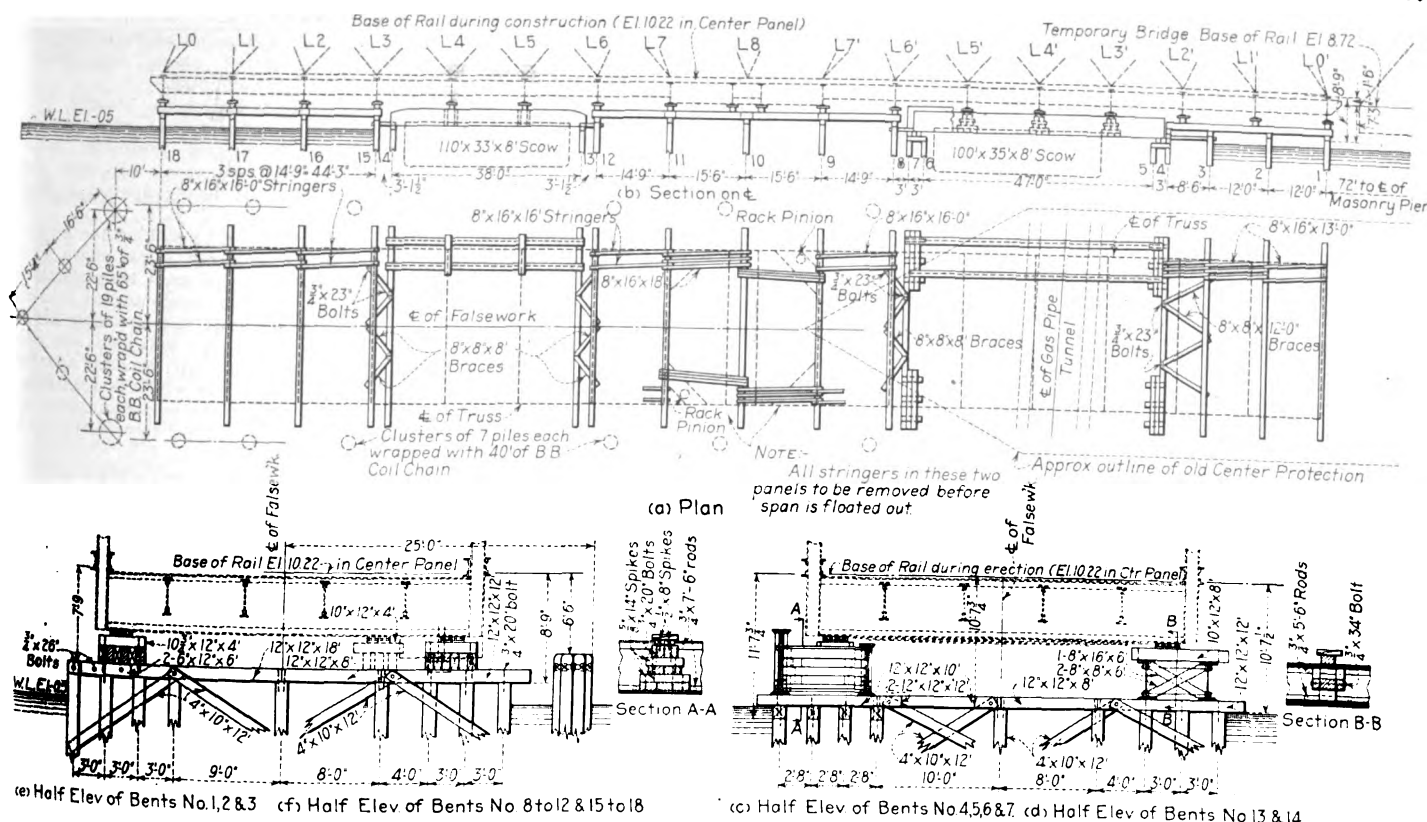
Plan, Elevation and Cross Sections of Falsework Used in Erecting New Swing Span of C. & N. W. Ry. Bridge.
